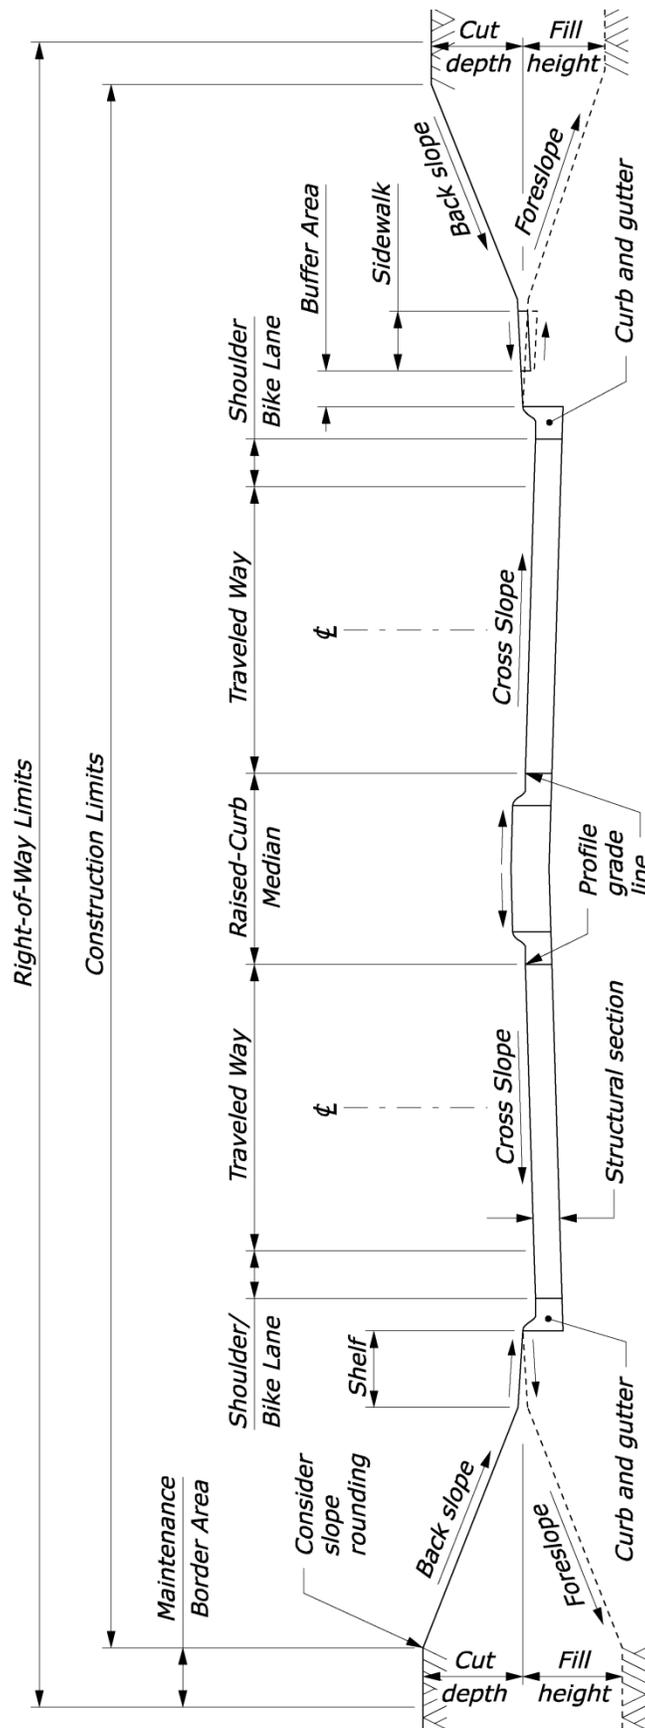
C TYPICAL URBAN CROSS SECTION ELEMENTS
